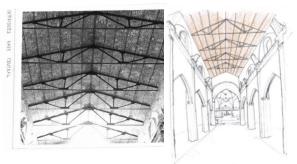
New roof made from 1970 to 1975 Architect José A Gómez Luengo. Photo and sketch of the author
